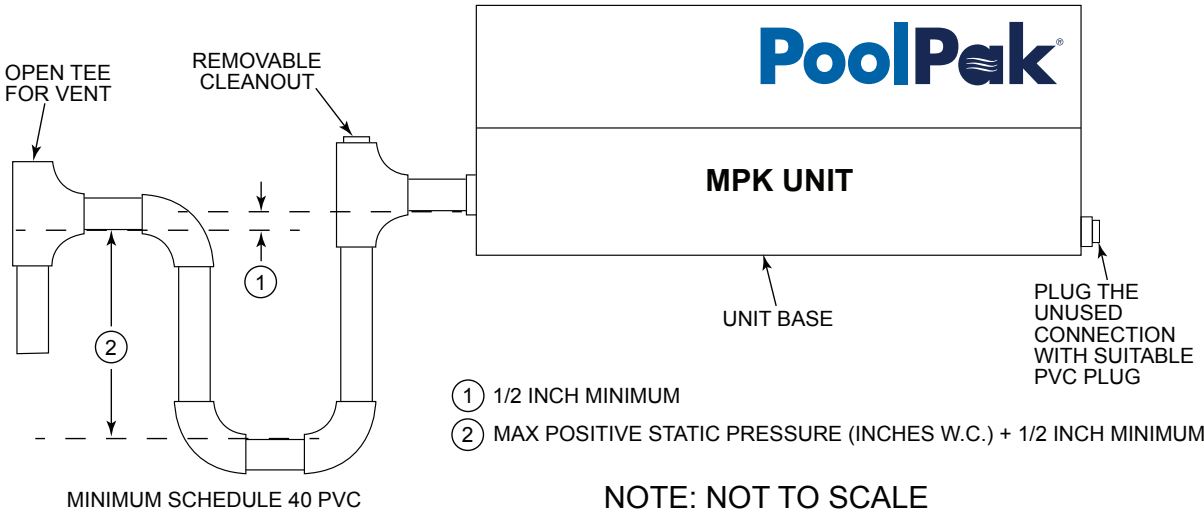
Positive Pressure Condensate Drain Piping Cross Section
